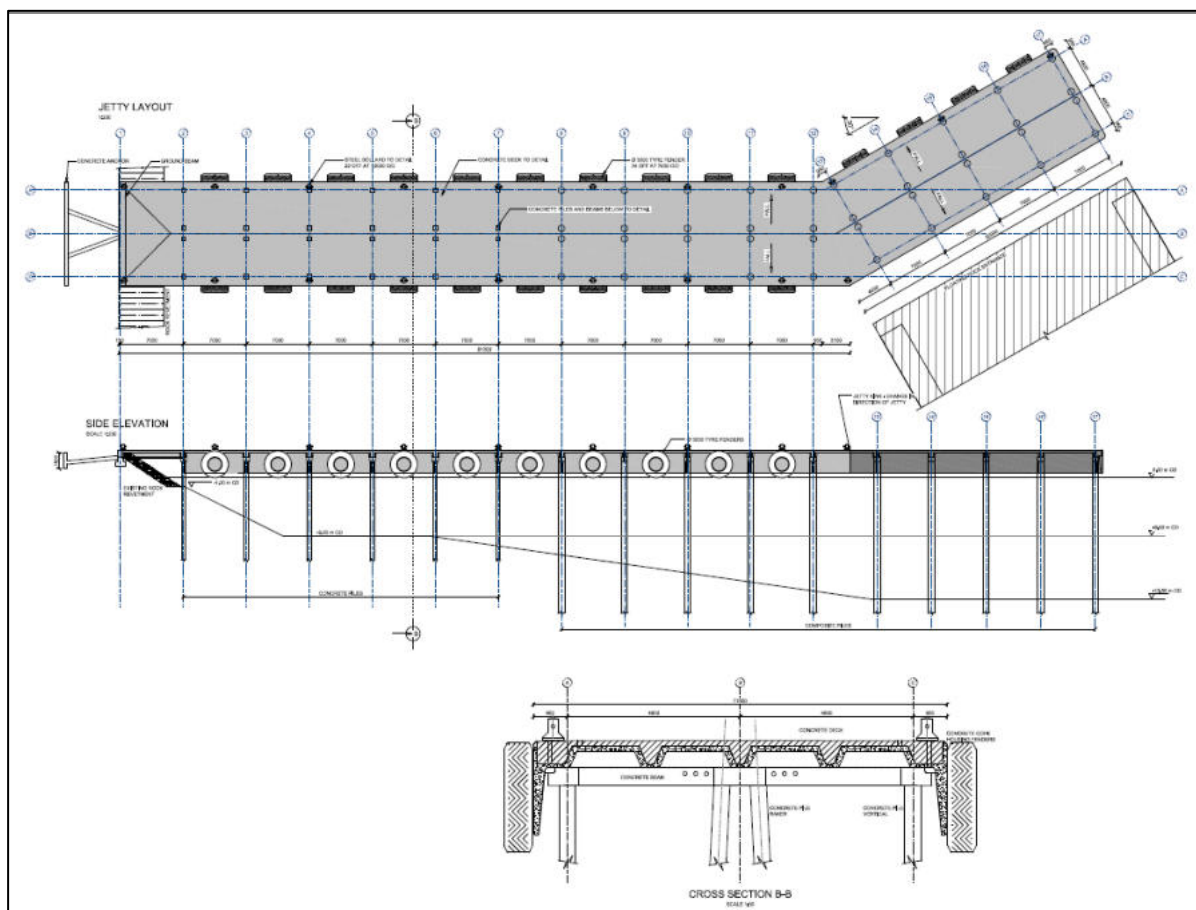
Detailed jetty layout plans for the proposed jetty
